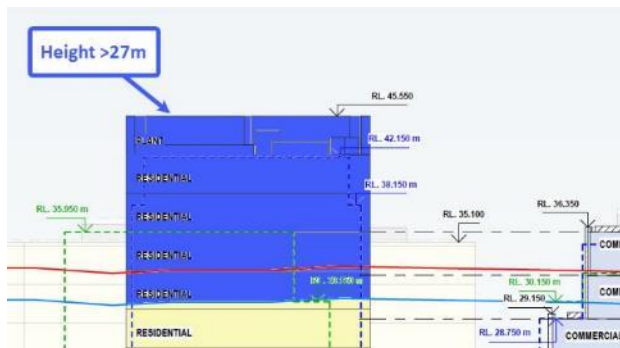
Building C - Courtyard Section Detail: Height >27m (Sydney LEP 2012, cl. 4.3)
